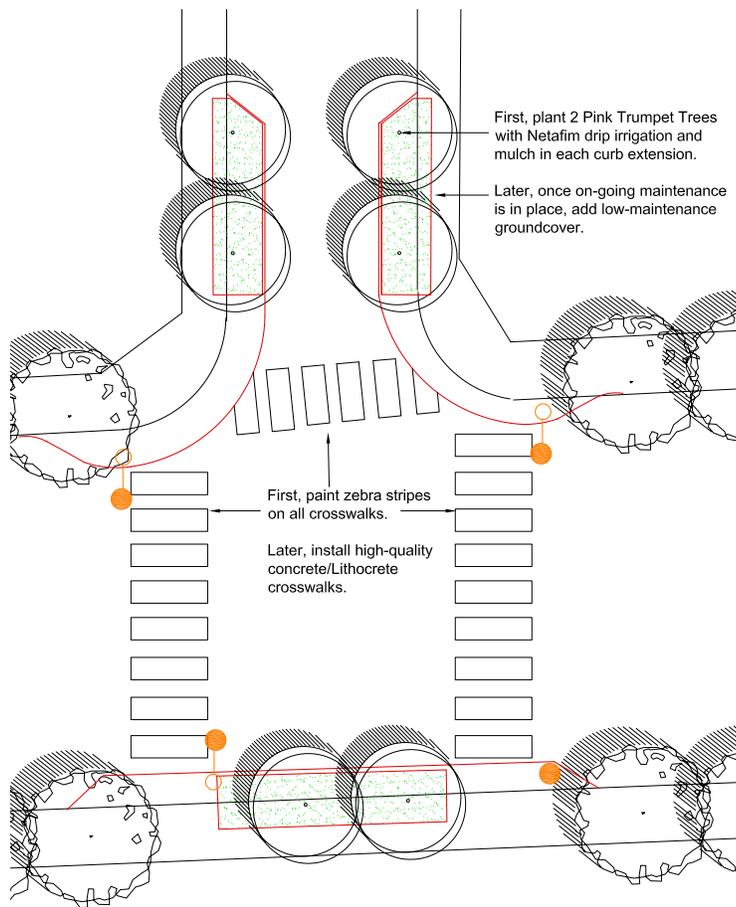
Typical Valley Boulevard Curb Extension/Crosswalk Plan
